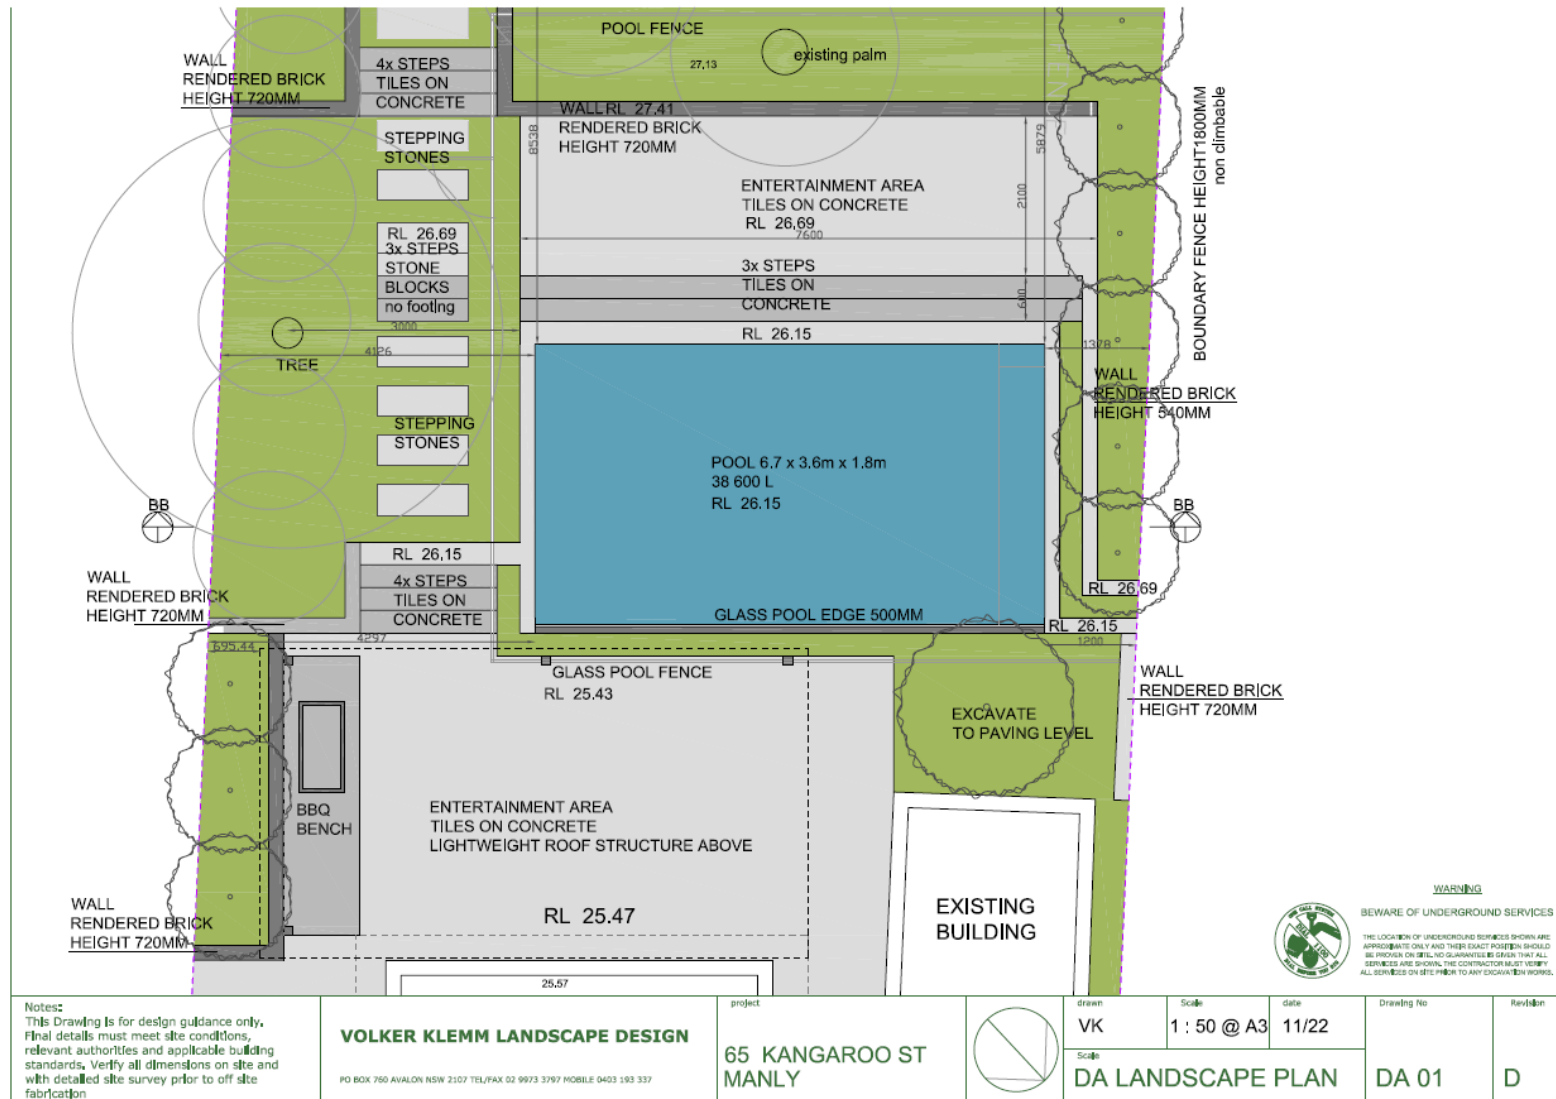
Pages 9, 10 & 11 contain Site Plans, Landscape Plan/Elevations/Sections.
